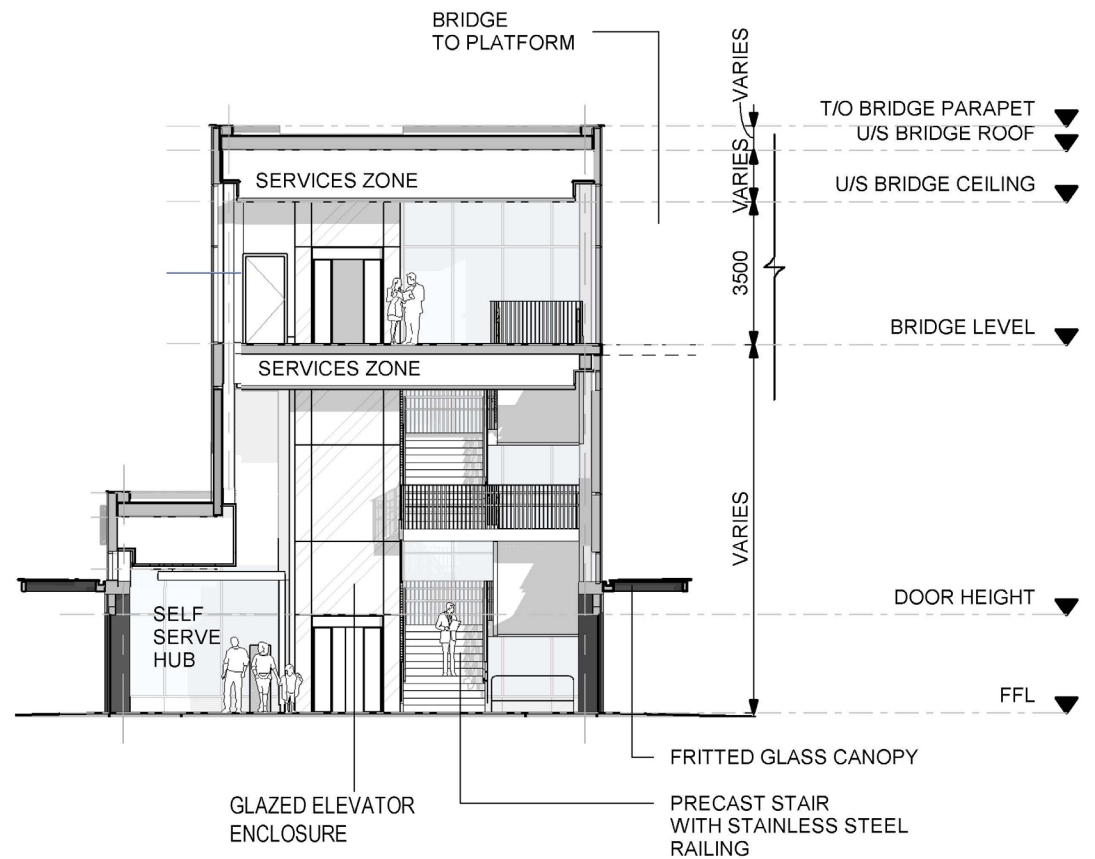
Longitudinal Section of Platform Access Module (Bridge configuration)
